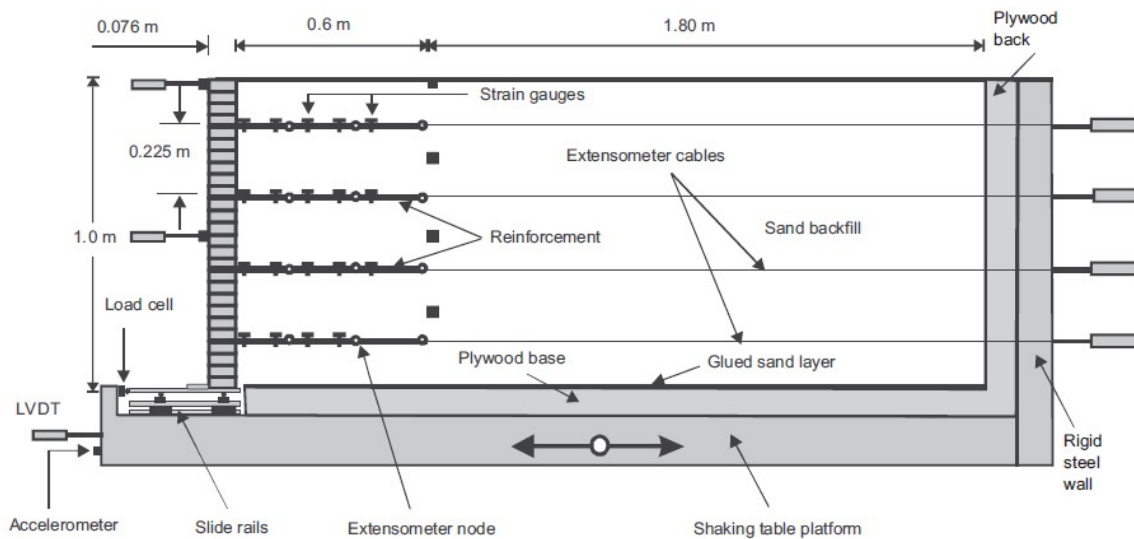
Cross-section view and instrumentation layout for reduced-scale reinforced soil model walls (from El-Emam and Bathurst 2005).
